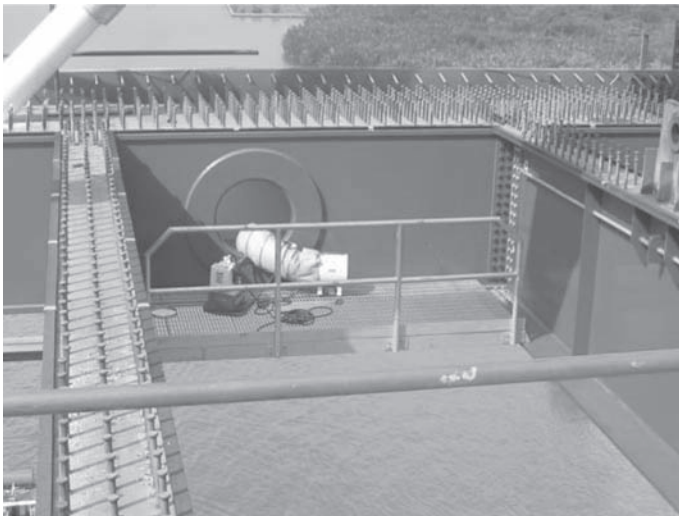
Edge girder can be accessed by walking on the floorbeam bottom flange to the platform.
